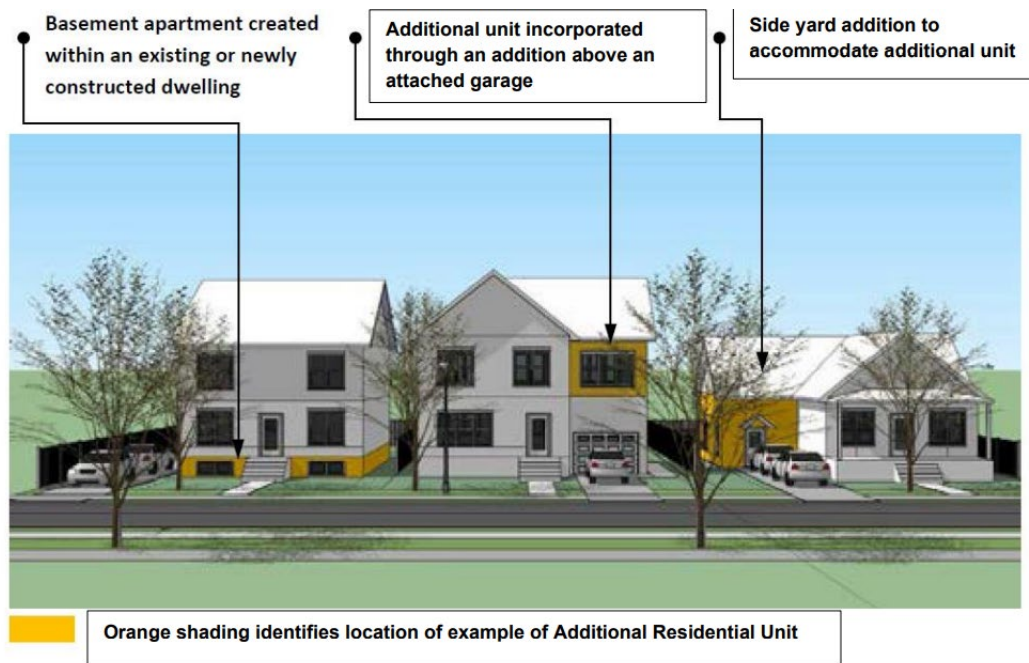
ARU locations within buildings (source: East Nipissing Official Plan)
